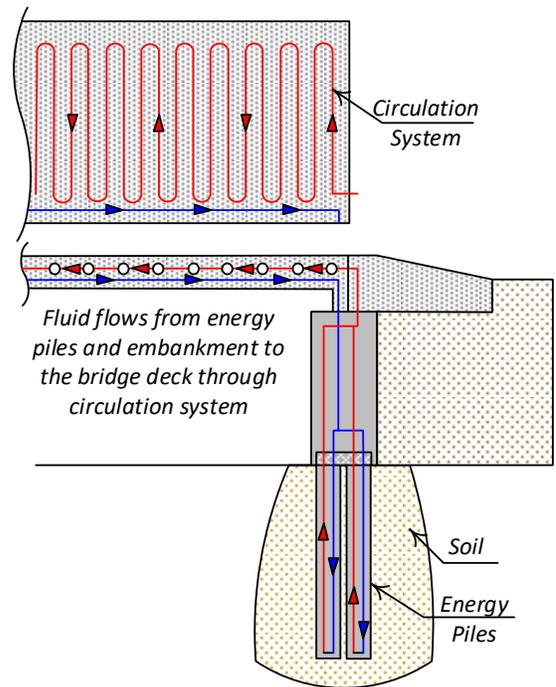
Schematic of Ground Source Heat Pump (GSHP) for bridge deck deicing (redrawn after Bowers and Olgun 2014).
